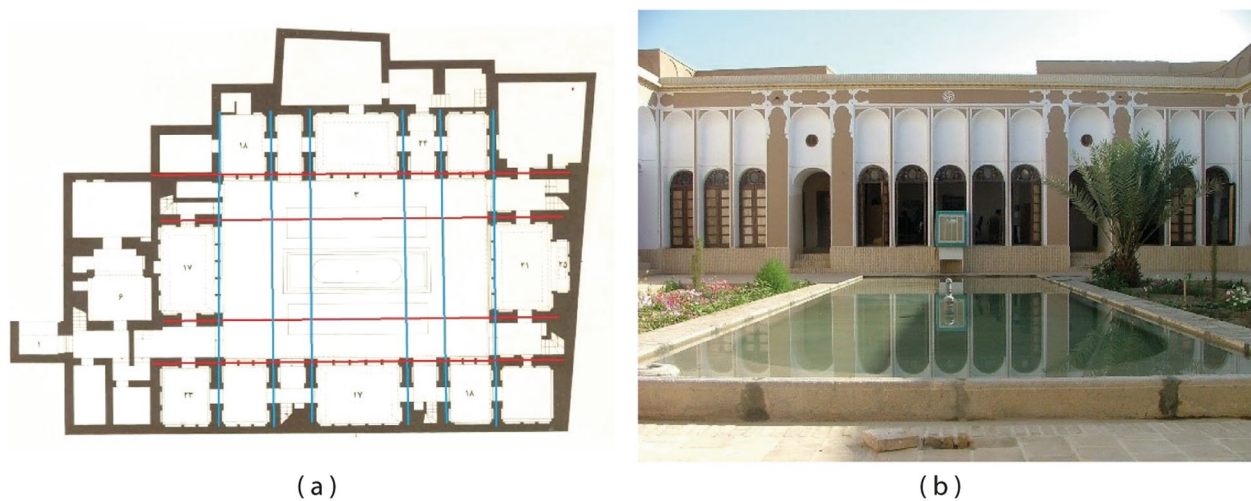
The rather symmetric plan and elevation of Yazd adobe houses: (a) plan of the Shafipoor house (Source: Haji-Qassemi and Khoei 2004) and (b) view of the Shokoohi house (Source: the authors)
